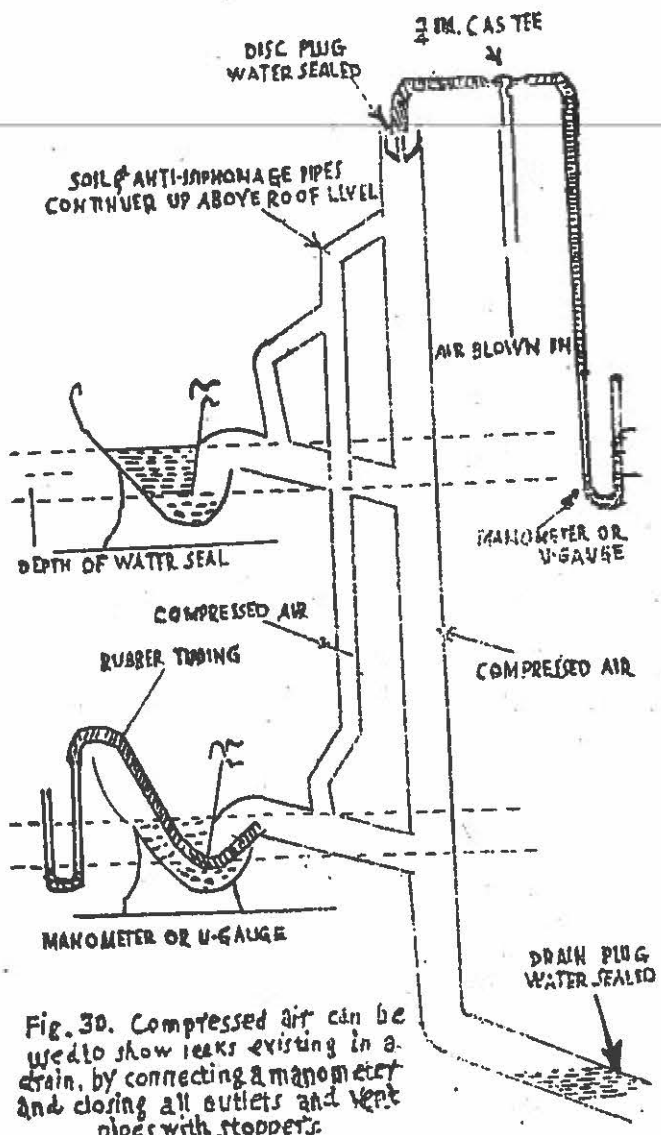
Compressed air can be used to show leaks existing in a drain, by connecting a manometer and closing all outlets and vent pipes with stoppers.
